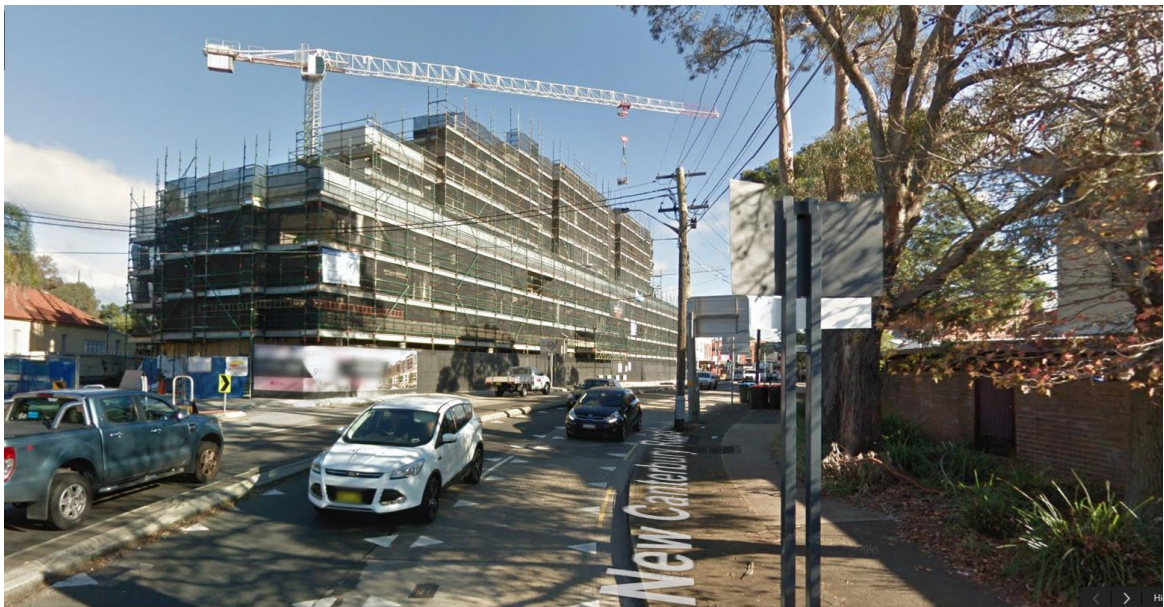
7 storey building under construction at 570 – 574 New Canterbury Road (Source: Google Maps)
